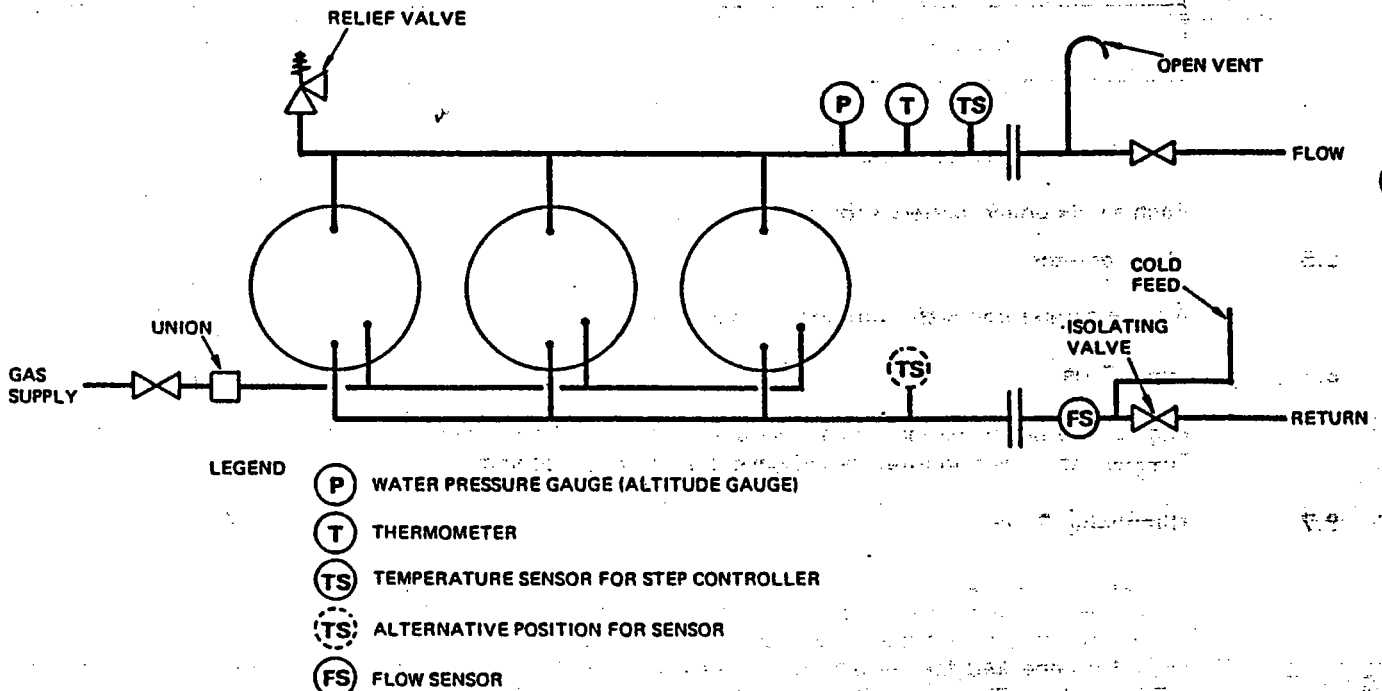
Schematic Arrangement of Water and Gas Pipework
